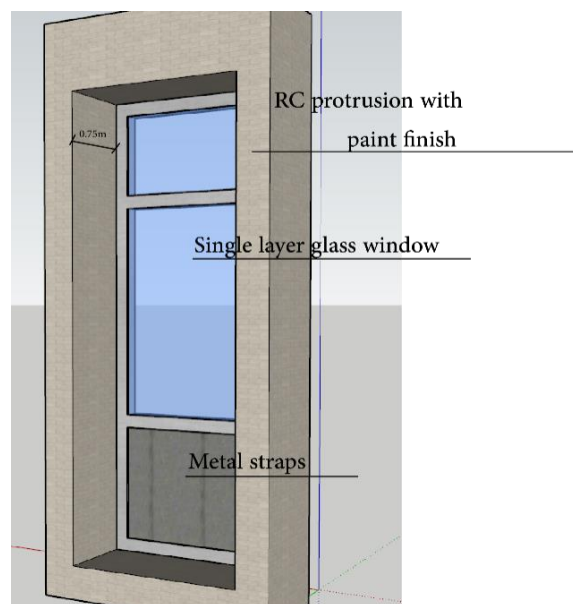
A 3D of a single unit on the façade, showing the existing façade design and materials
